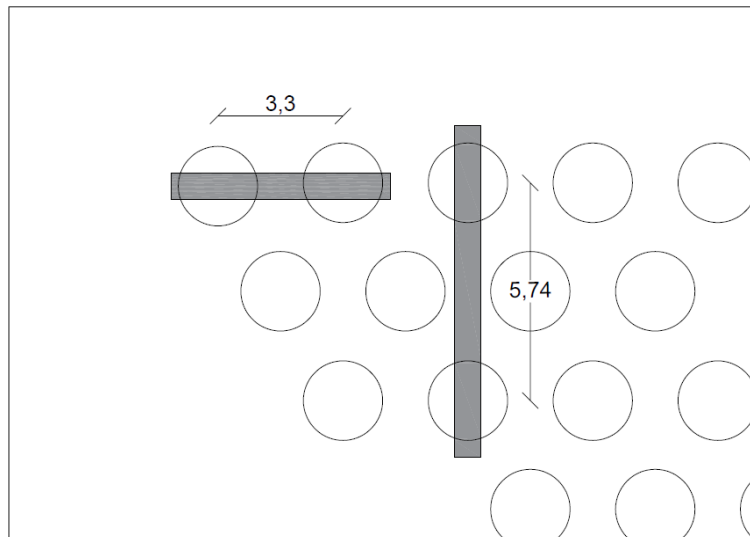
Equivalent Wall Spacing for Profile and Cross-Section Models
